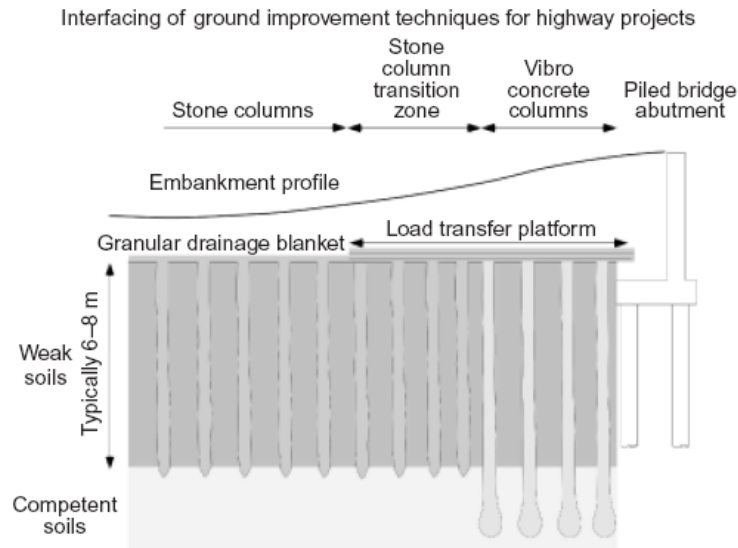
Interfacing of Ground Improvement Techniques beneath Embankment Approach to Piled Bridge Abutment (Serridge and Synac, 2007)
